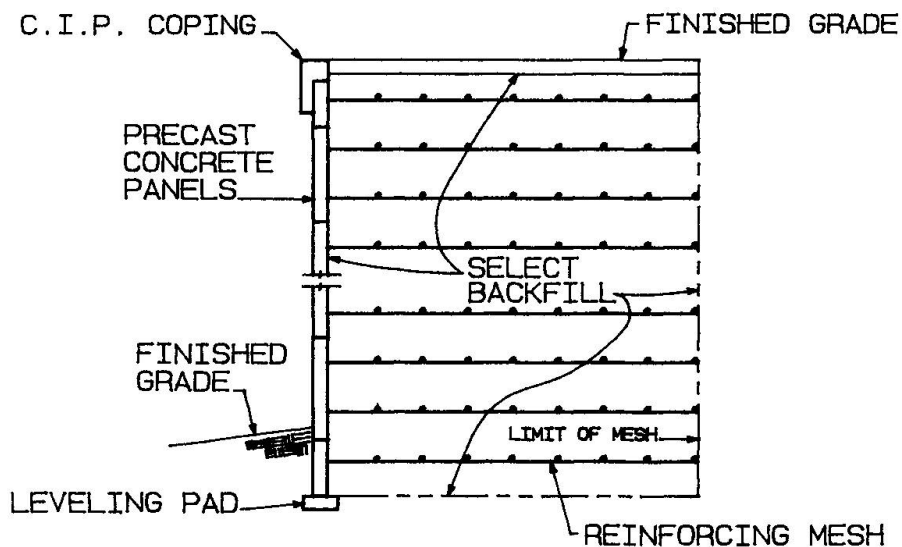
TYPICAL SECTION THROUGH R.E. WALL
